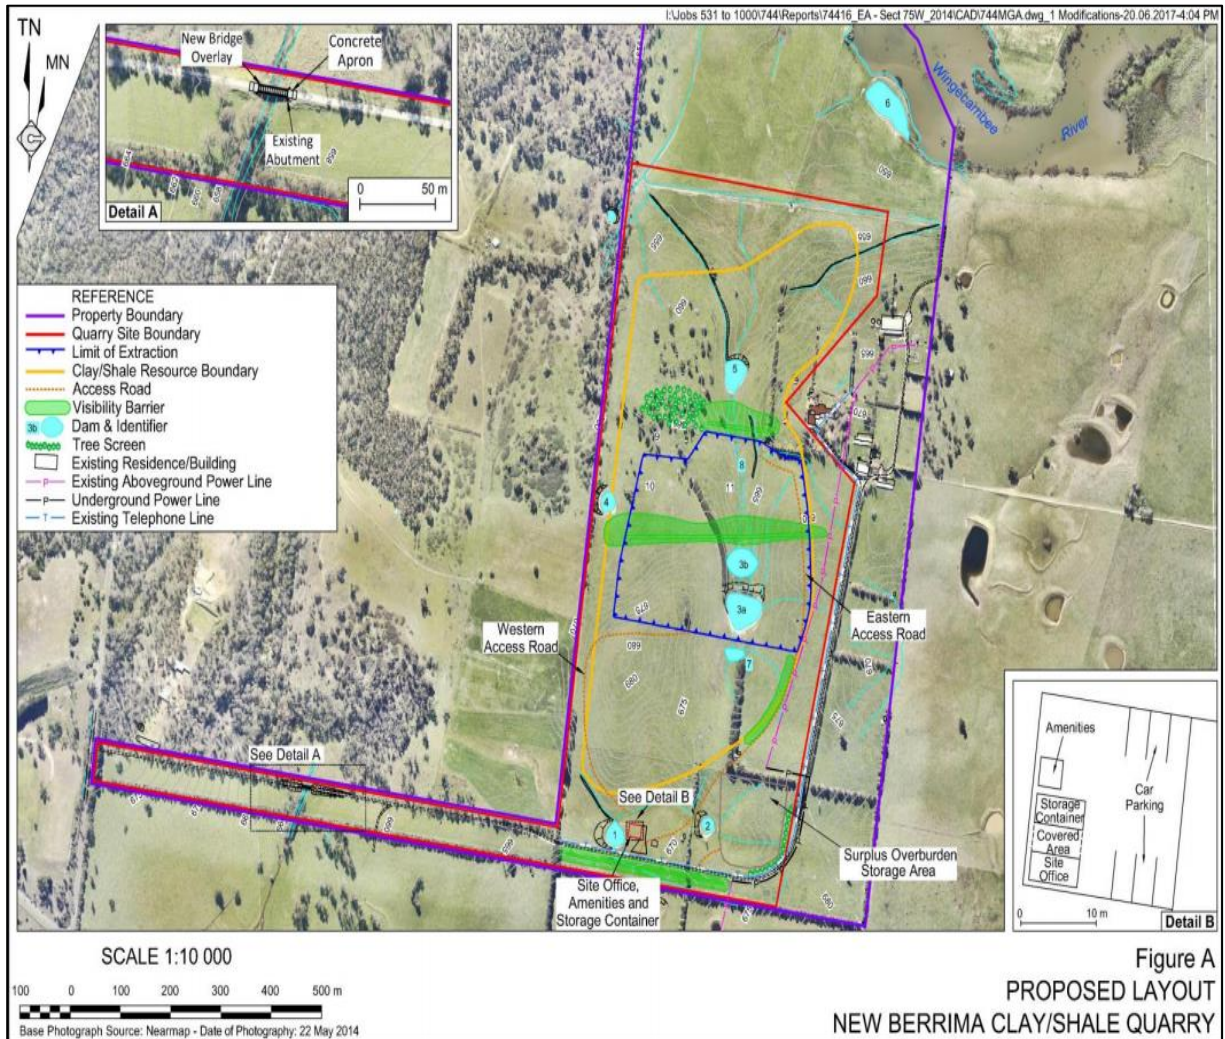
New Berrima Shale Quarry Project Approval 08_0212 layout (see also Attachment 5)
